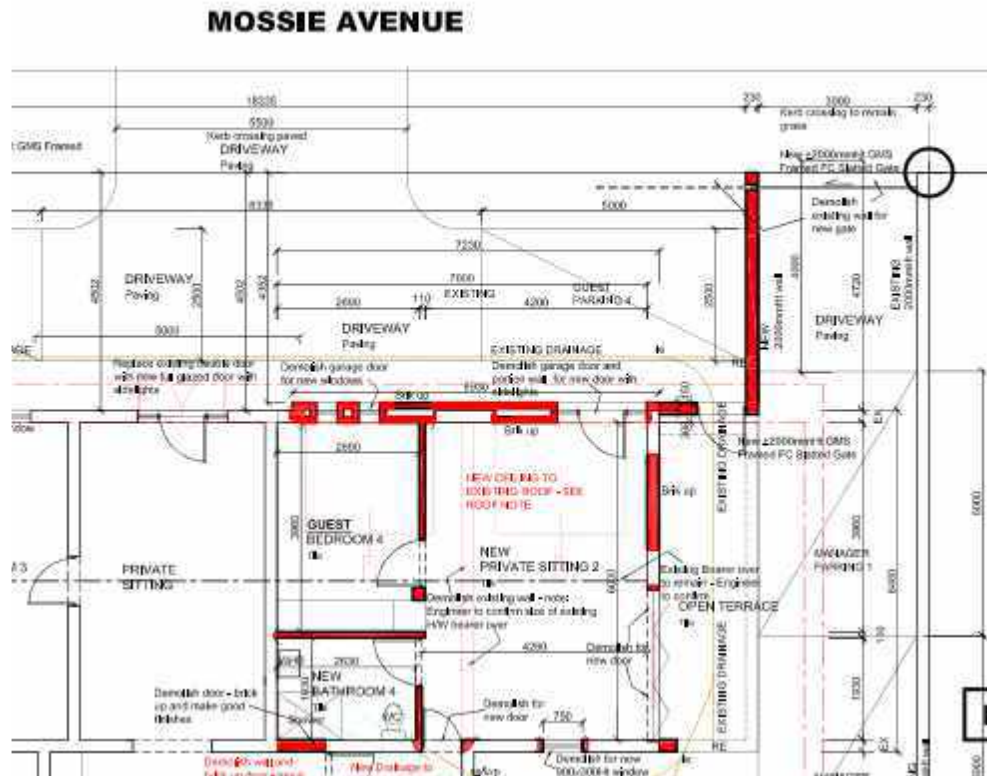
Position of the As Built unlawful structure / proposed guest bedroom no. 4, new private sitting room no. 2, new bathroom no. 4 and open terrace as indicated on the site plan
